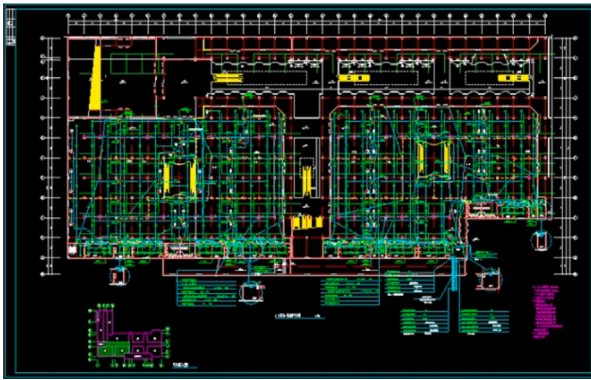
Fire protection CAD engineering drawing display. The layout of firefighting equipment, escape routes, ventilation systems, and other important firefighting facilities inside the building are shown in detail. The complex lines and symbols in the figure represent the different systems and facilities of the building, showing the various paths and obstacles that may be involved in the evacuation process.
